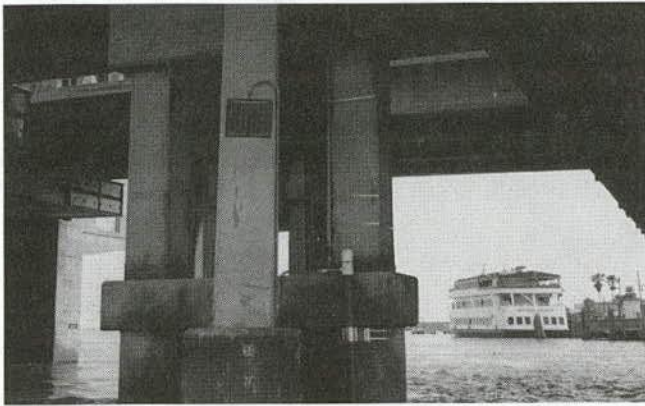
Solar panel installation at Johns Pass bridge (Site FL1).
